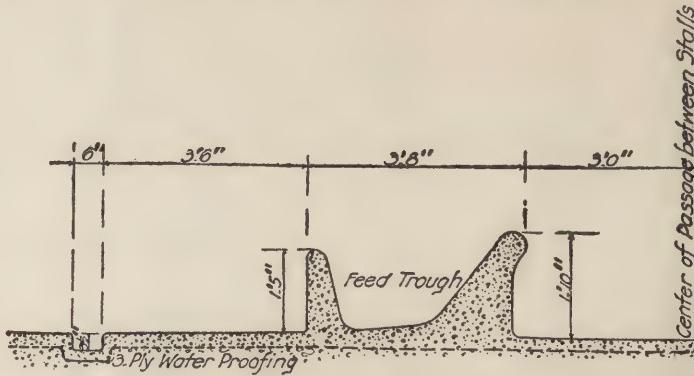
Section Showing Details of Concrete Floor for a Cow Stable.
